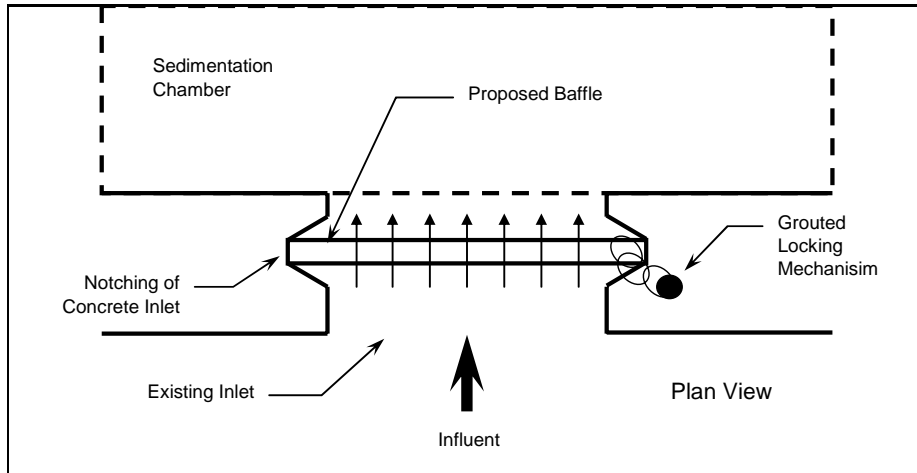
Plan View of Proposed Baffle Wall for Sedimentation Chamber Inlet
